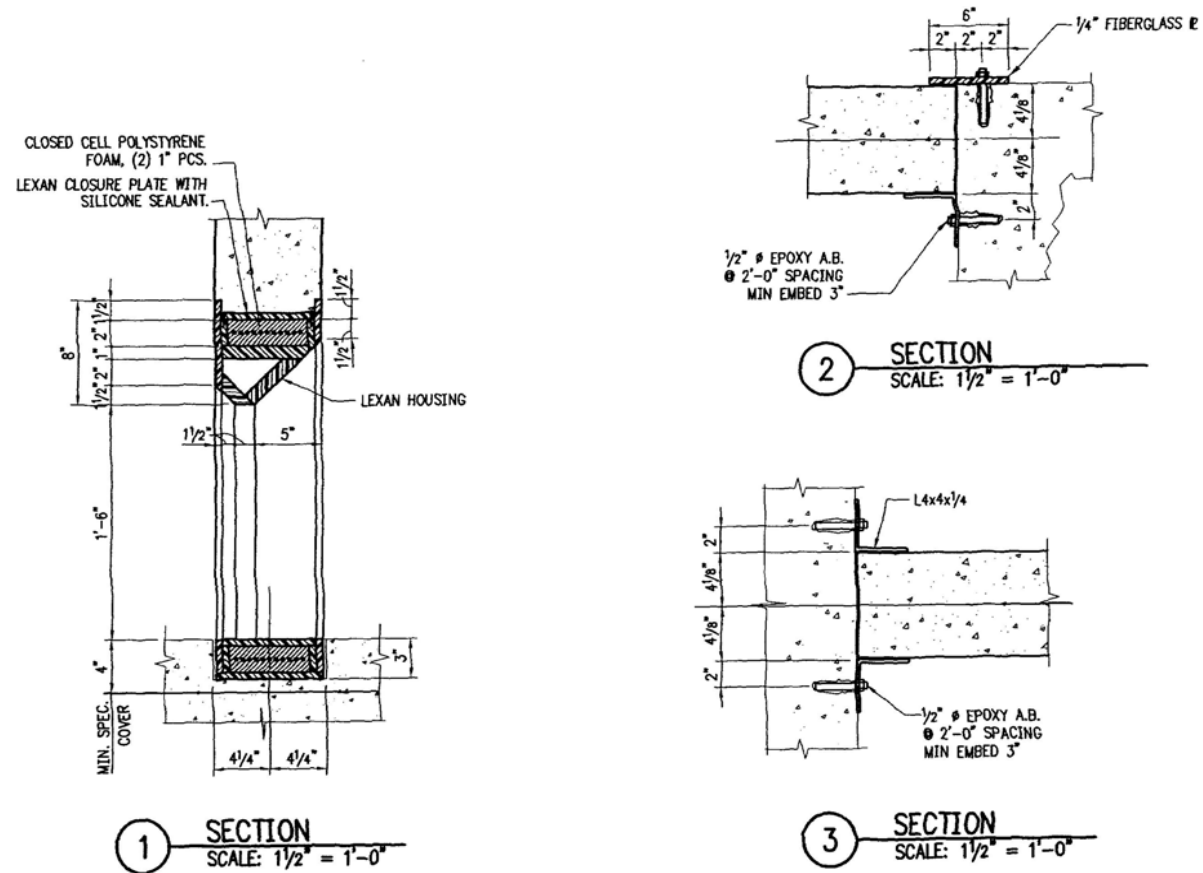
Orifice/ Weir Antenna Housing - Sections (Fiberglass Reinforced Concrete)
